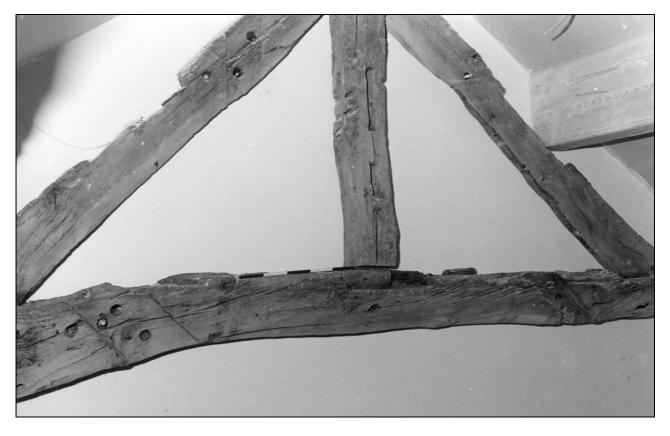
Truss Y, re-sited, from the south (film 1, frame 2)
